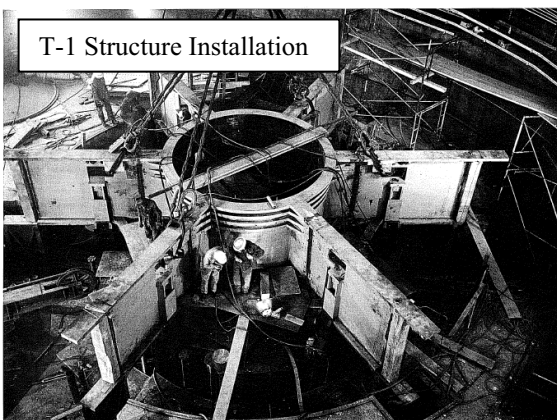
Welding Radial Beam Support Traps
